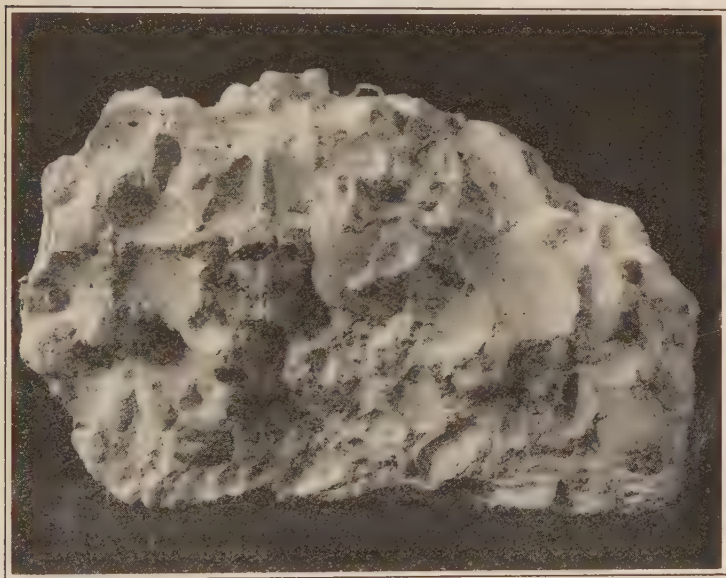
SAMPLE OF CONCRETE FROM FOUNDATION OF BULKHEAD WALL AT FOOT OF OLD SLIP, MANHATTAN, SHOWN IN FIG. 7.
